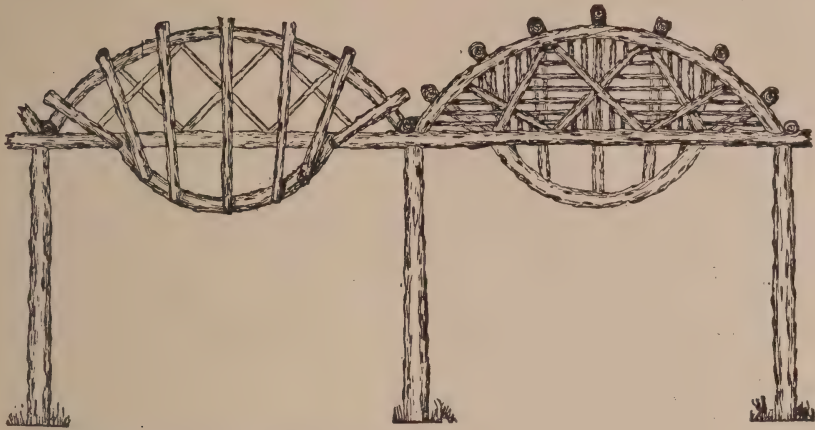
Design of Pergola with Alternating Segmental Roof Spar
